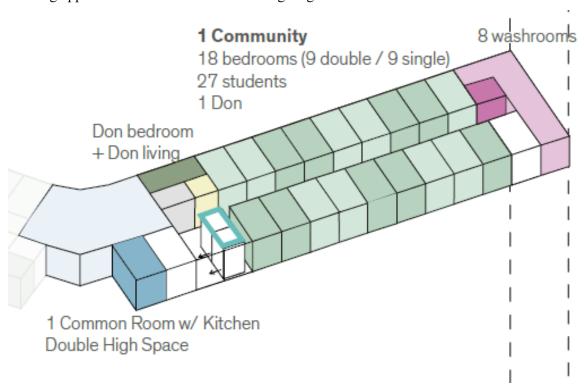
Cluster of Common Rooms, Bedrooms and Washrooms on a Typical Floorplate (Christensen & Co/ Montgomery Sisam)
